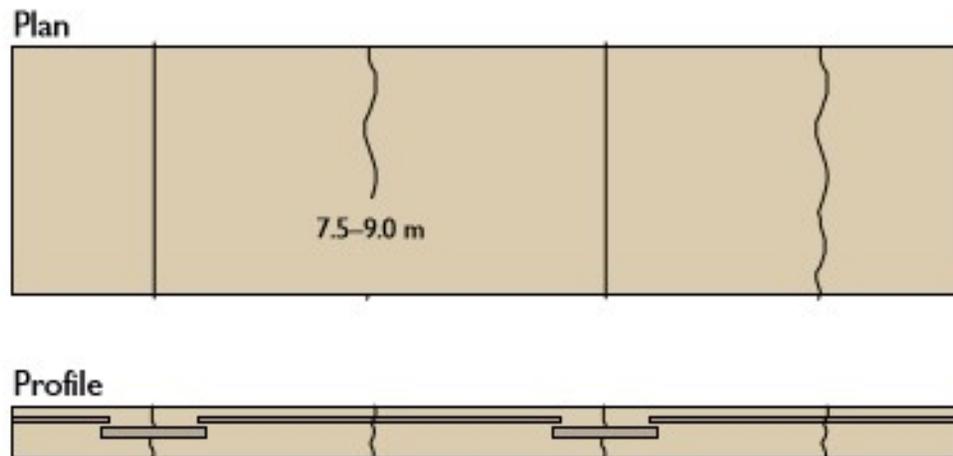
Jointed reinforced concrete pavement (JRCP) (courtesy: ACPA).
